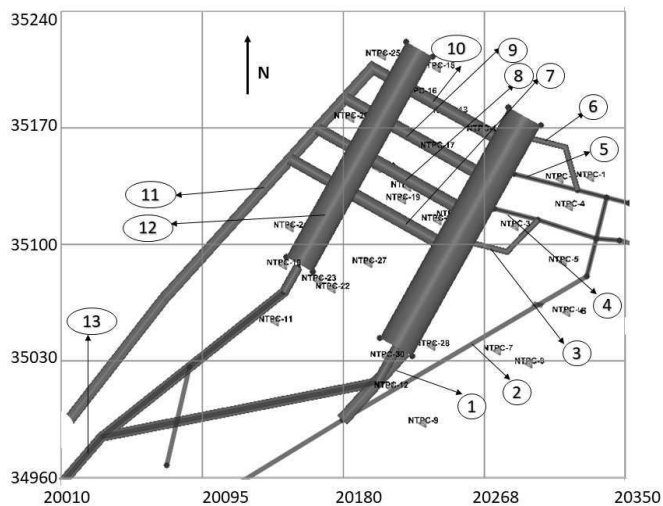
TVHPP Powerhouse complex layout with 3D visualization of installed geophone locations (1: Main access tunnel, 2: Adit to Pressure Shaft, 3: UPS-1, 4: UPS-2, 5: UPS-3, 6: UPS-4, 7: Connecting Tunnel, 8: Bus duct-1, 9: Bus duct-2, 10: Escape tunnel, 11: Tail race tunnel, 12: Transformer hall and 13: Cable ventilation tunnel).
